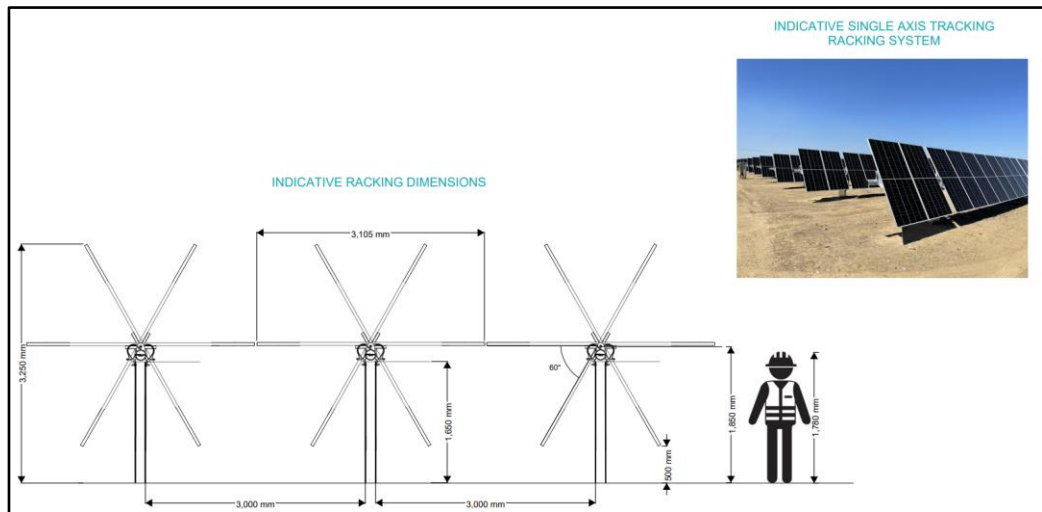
Single axis tracking structural details (Source: Beca Civil Drawings).
